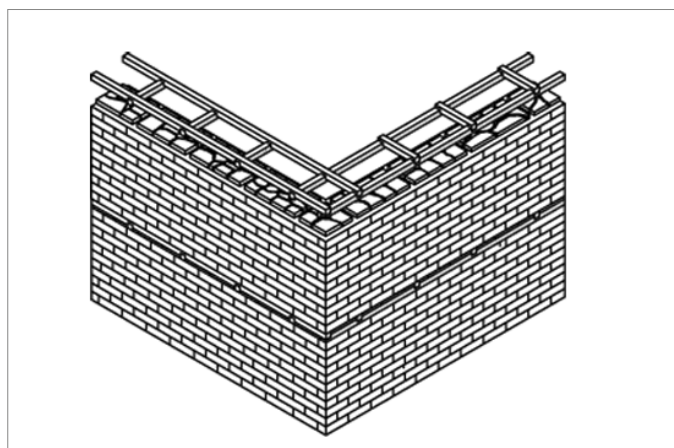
Building system scheme of timber hooping (drawing: D. Omar Sidik).
